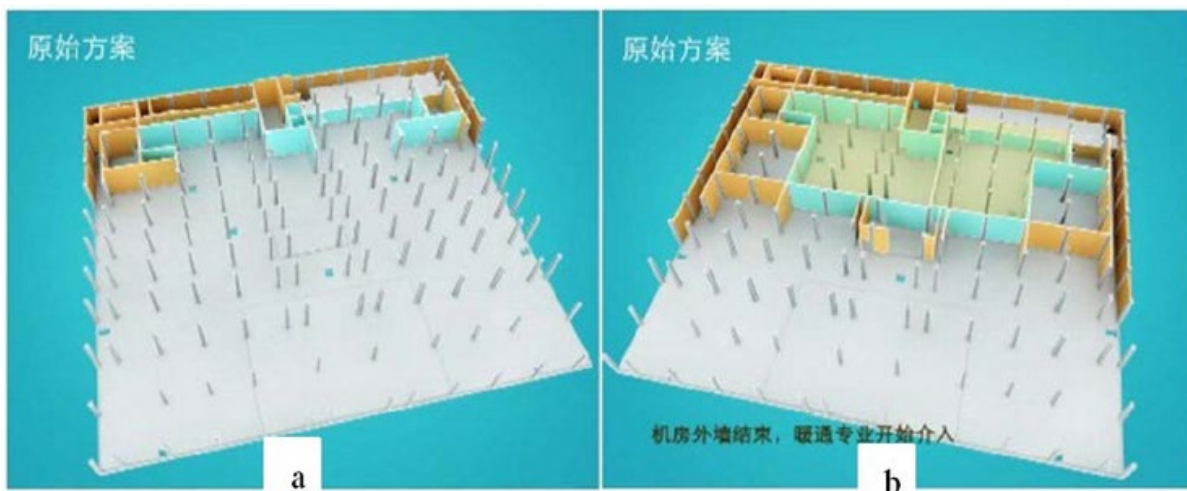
Original construction scheme prior to optimisation: a) Stage 1; and b) Stage 2
